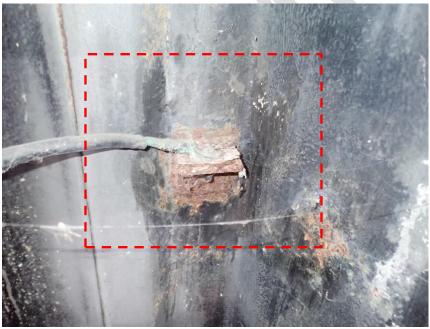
Negative wire connection from rectifier to bulkhead wall, showing visible signs of corrosion at connection point.
